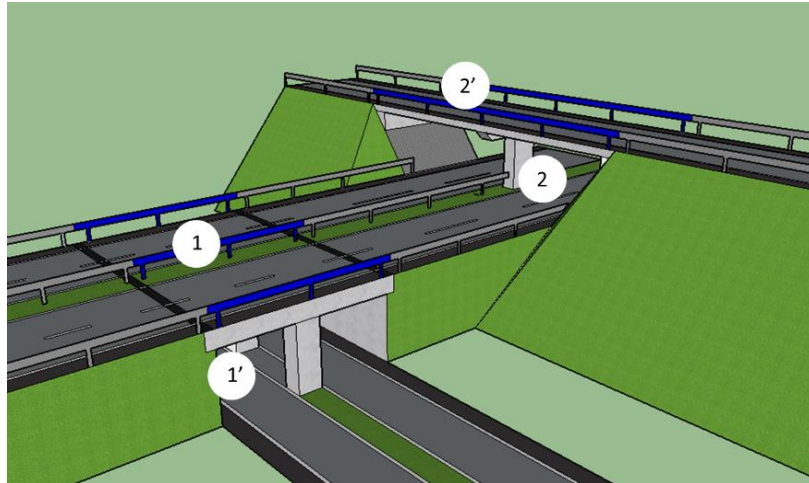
Bridges of study. (1) Bridge over which passes the highway, (1') Road under the highway bridge, (2) Bridge over the highway and (2') Road on the bridge over the highway.
